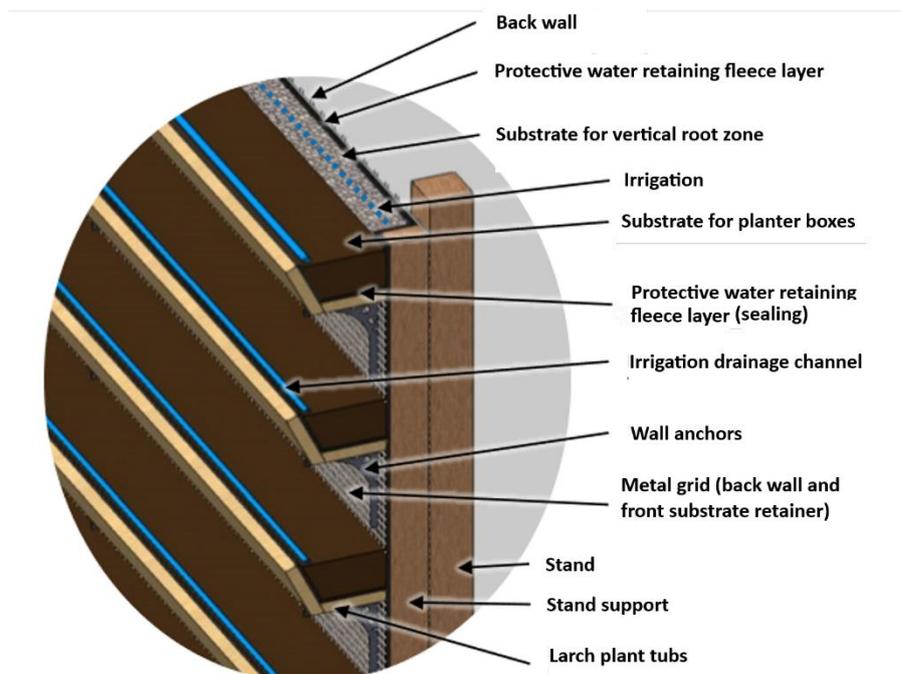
Sectional view with layer structure and designation EVAPO+ green wall
